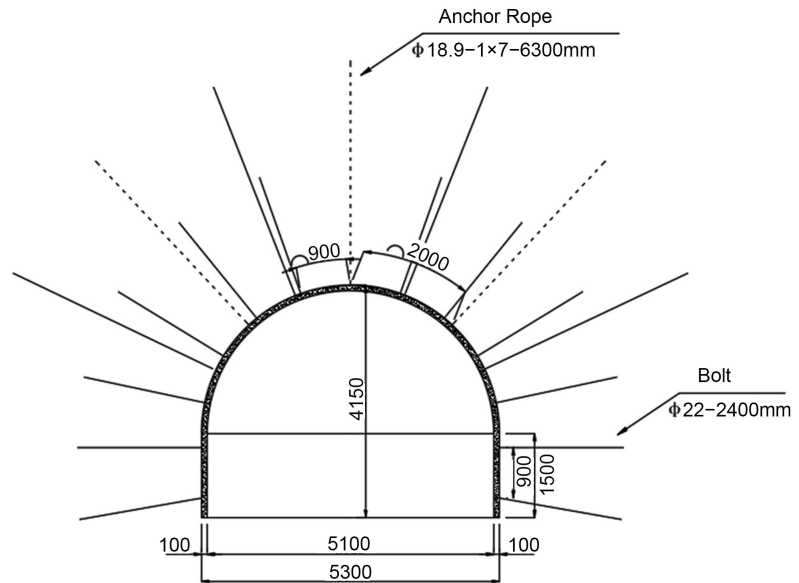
Straight wall semi-circular arch roadway bolt, anchor cable layout diagram.
